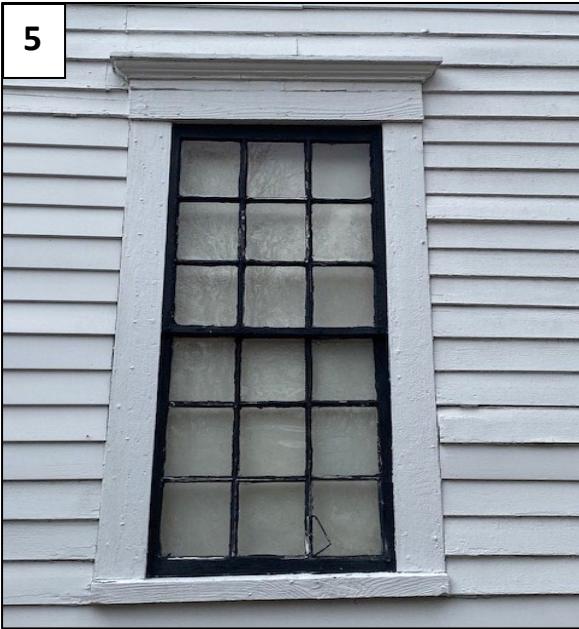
East Elevation, 9/9 double-hung window on the first floor of the east elevation. These may be the oldest surviving windows in the building, potentially dating to the eighteenth century.
